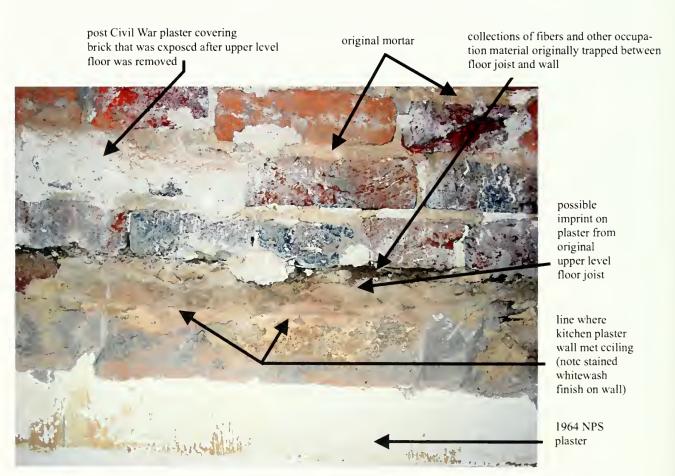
East room, west wall, 2003. Showing evidence of original floor level between upper living space and lower-level summer kitchen.
